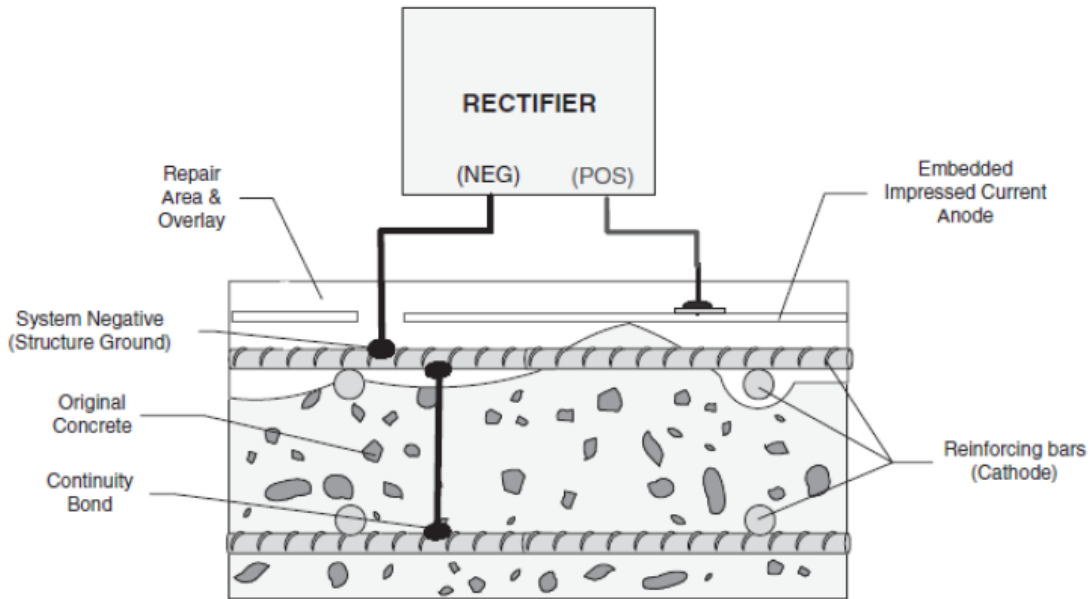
Schematic layout of cathodic protection for reinforced concrete bridge deck
